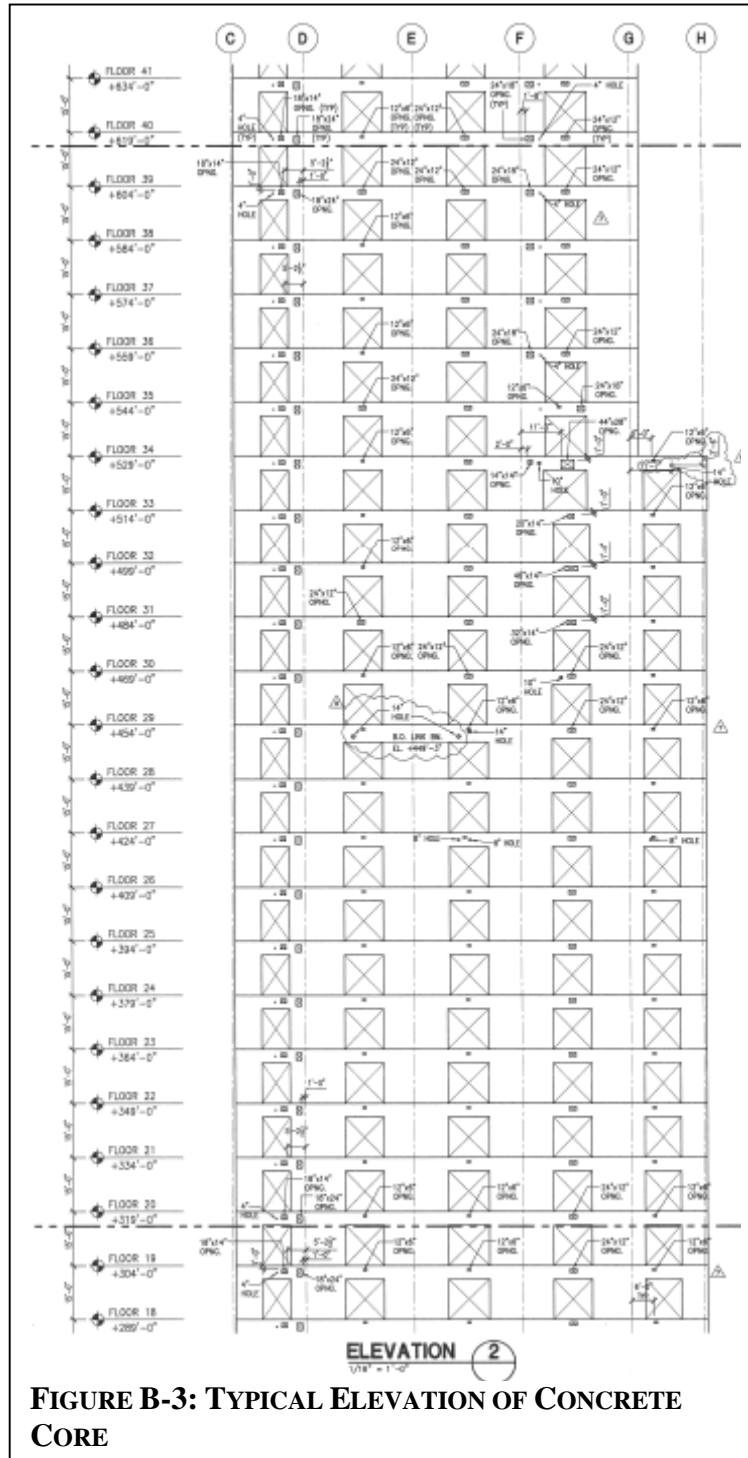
TYPICAL ELEVATION OF CONCRETE CORE
